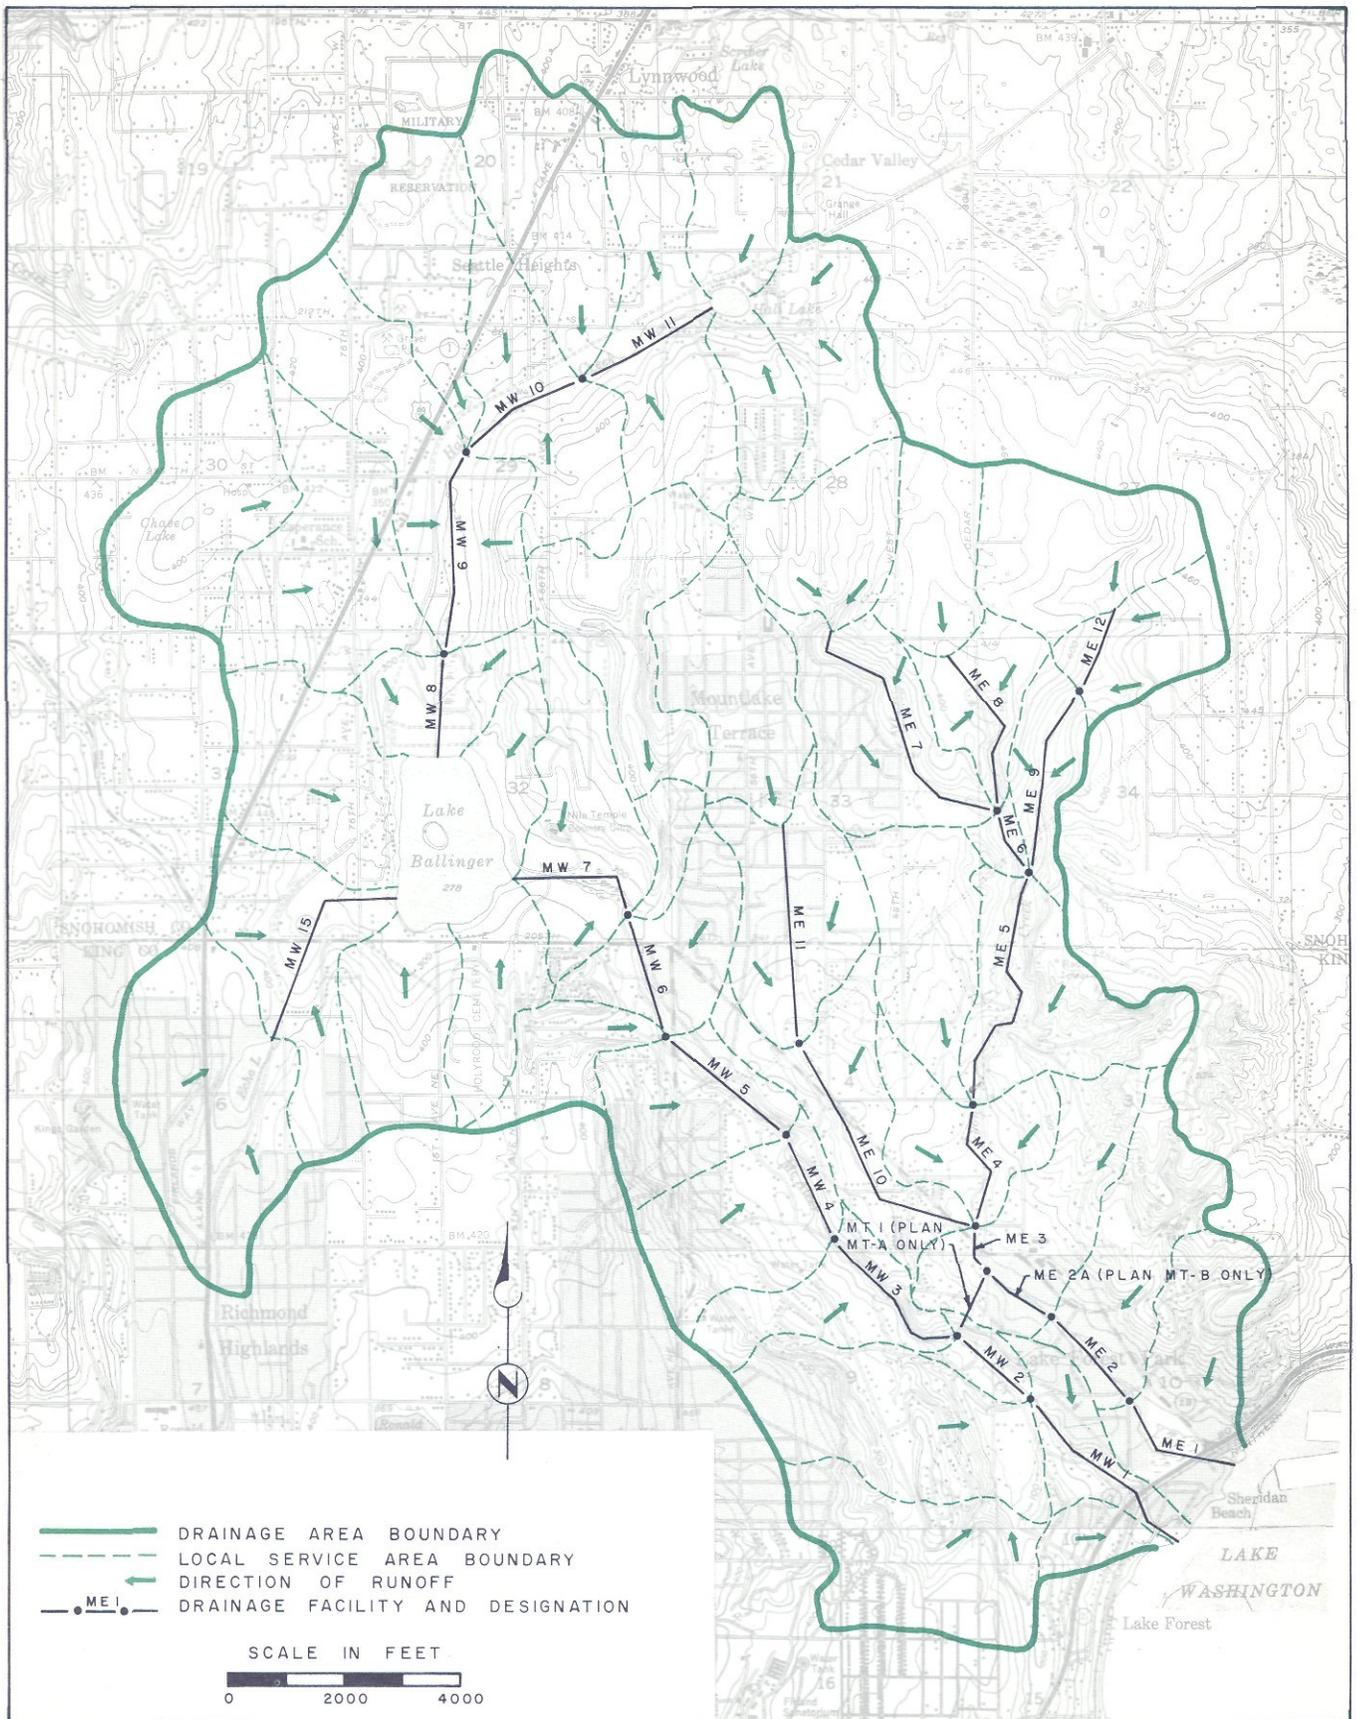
Storm Drainage Plans MT-A and MT-B, Mountain Terrace Area
